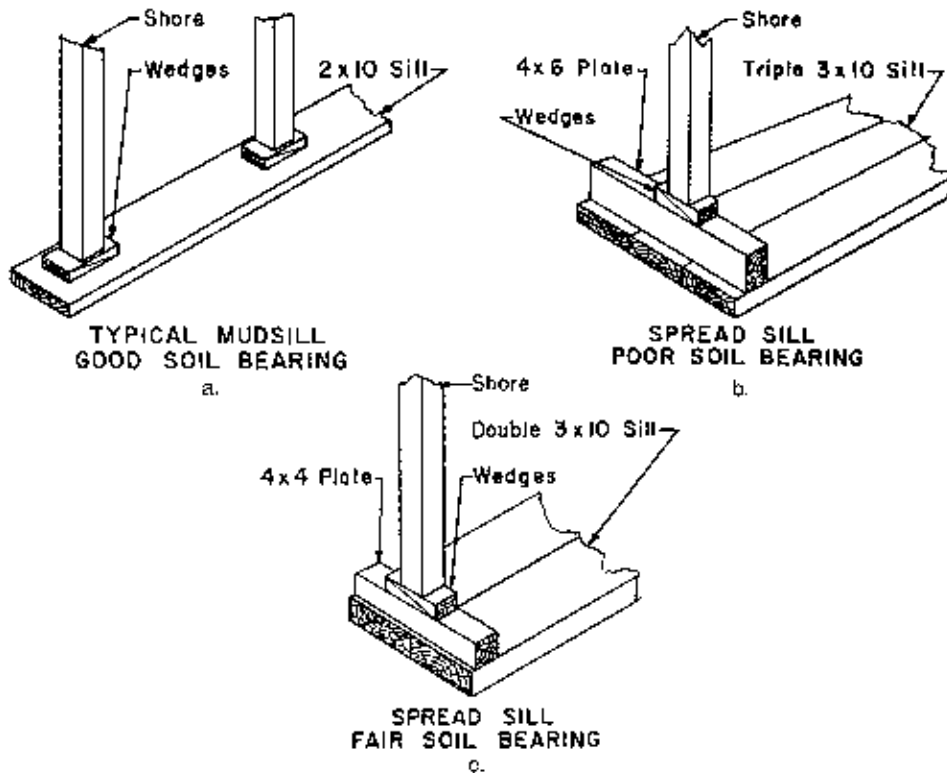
Mudsills. (Courtesy of American Concrete Institute)
